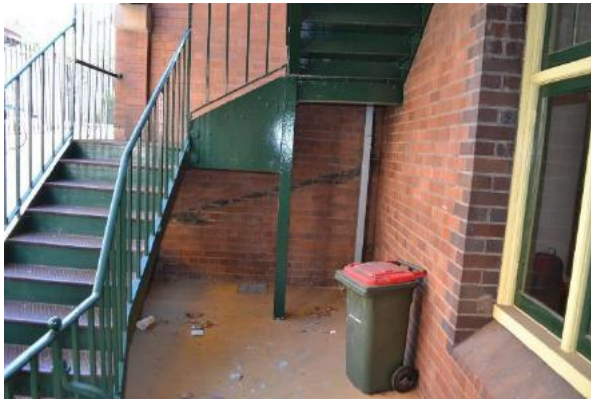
Front yard area (space E.1) showing steel down pipes and face brick end wall—46/46–56 Gloucester Street. (Source: GML Heritage July 2016)
